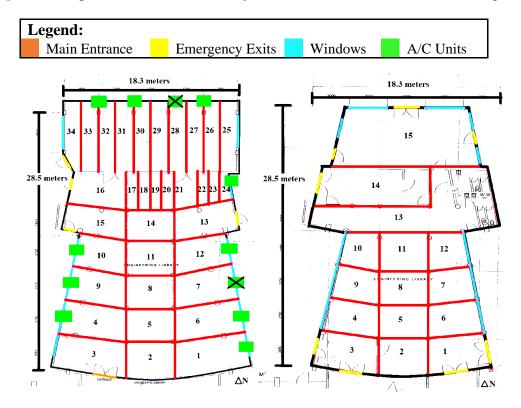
Respective divisions of Library Ground Floor (left) and Basement (right)
